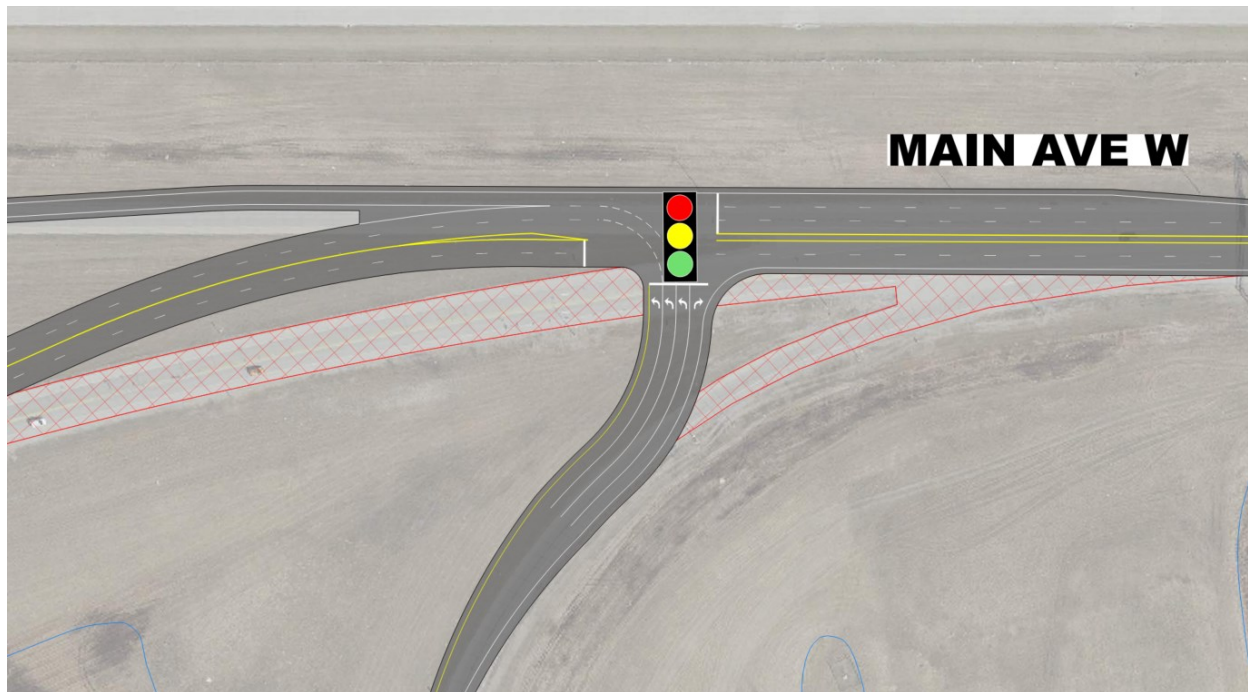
Main Avenue/Westbound I-94 Exit Ramp Intersection (Full Build)
